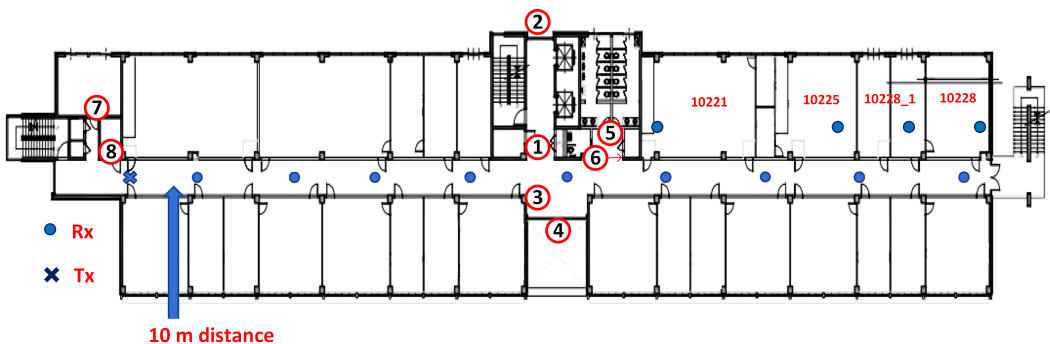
Architectural drawings of the 10th floor IT building corridor.
